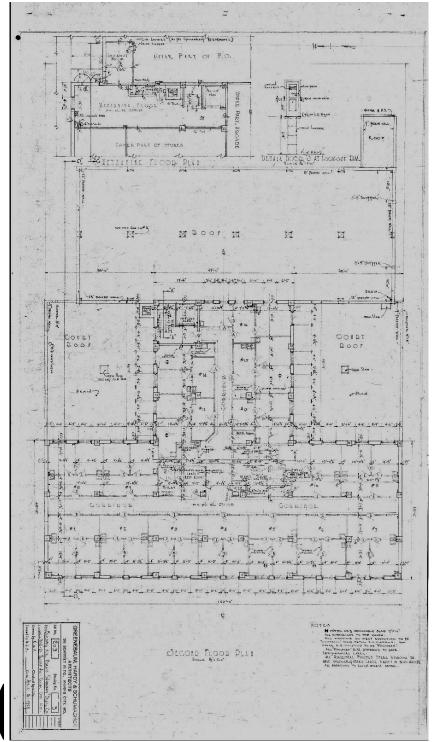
Historic Floor Plans – Second Floor (Third floor is similarly configured) – Not to Scale Greenbaum, Hardy & Schumacher, Architects, 1929
